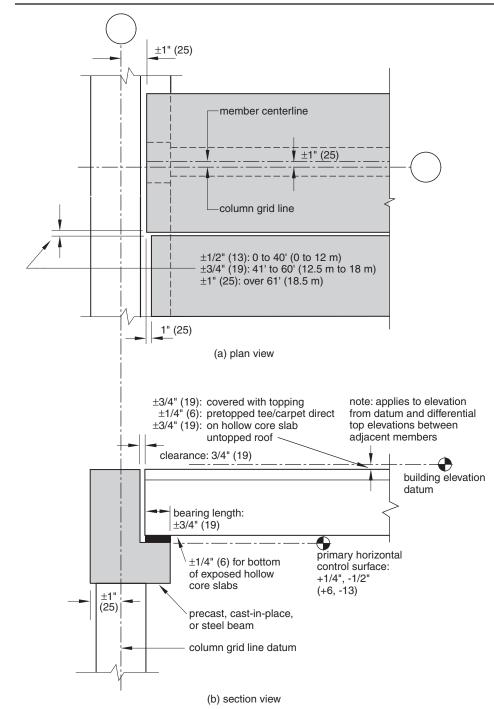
Precast floor/beam erection tolerances 03 45 91
